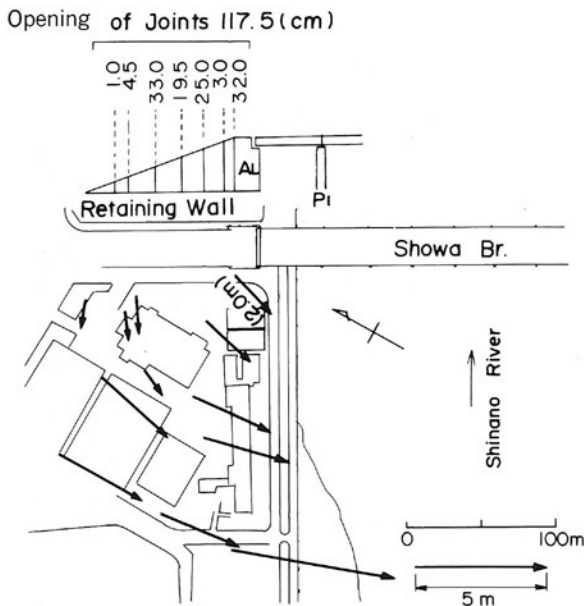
Damage to retaining wall of access road of Showa Bridge<sup>(1)</sup>
